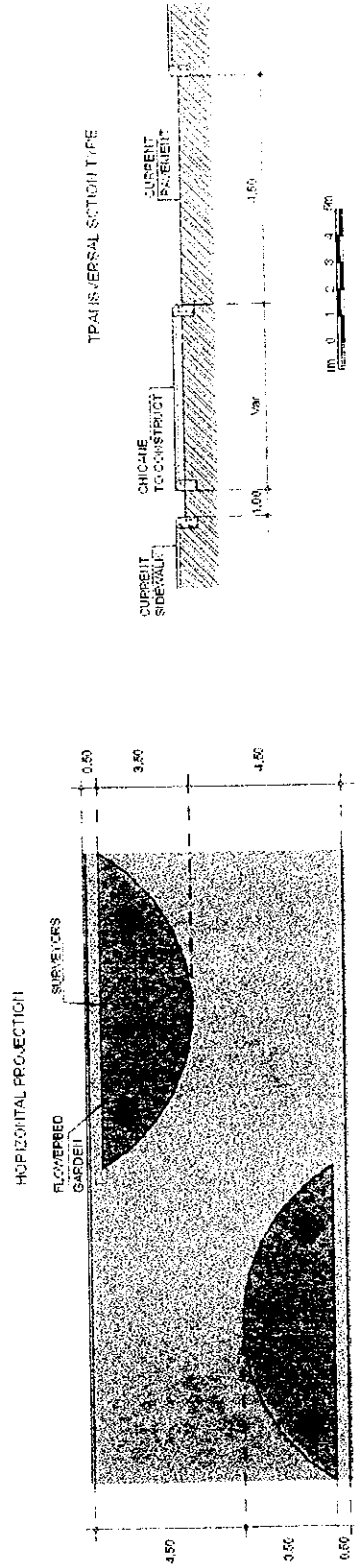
Traffic Calming - Details Type 1 and Type 2
